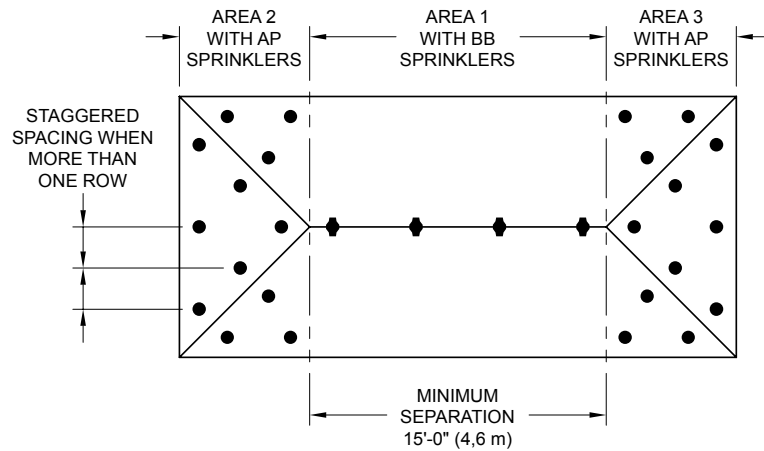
B-3. BB Sprinklers & AP Sprinklers At The Hip
